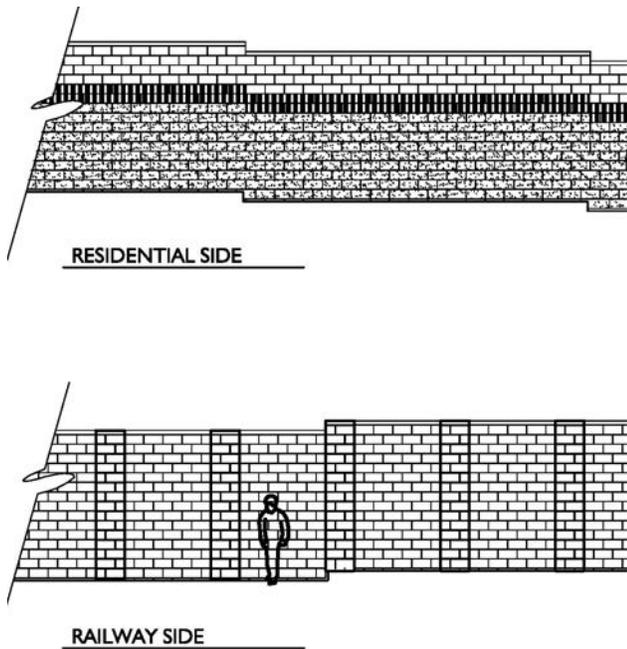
Boundary wall design concept (Village Neighborhood only)
